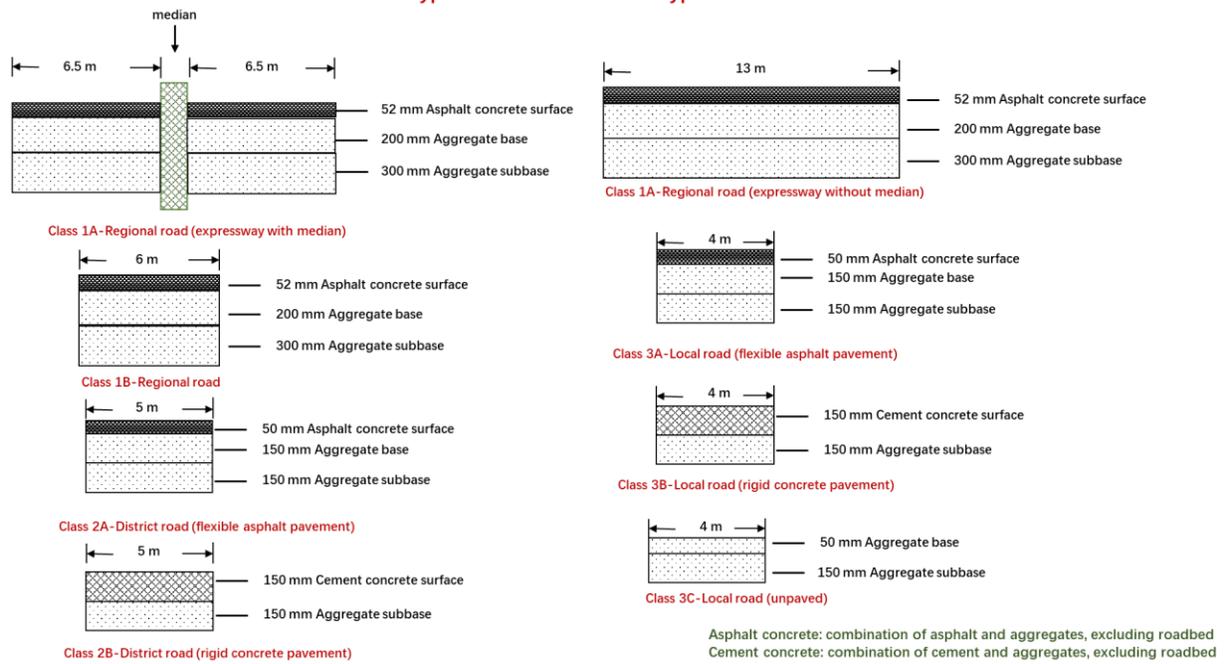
Typical road cross sections in Grenada used for developing material intensity.
